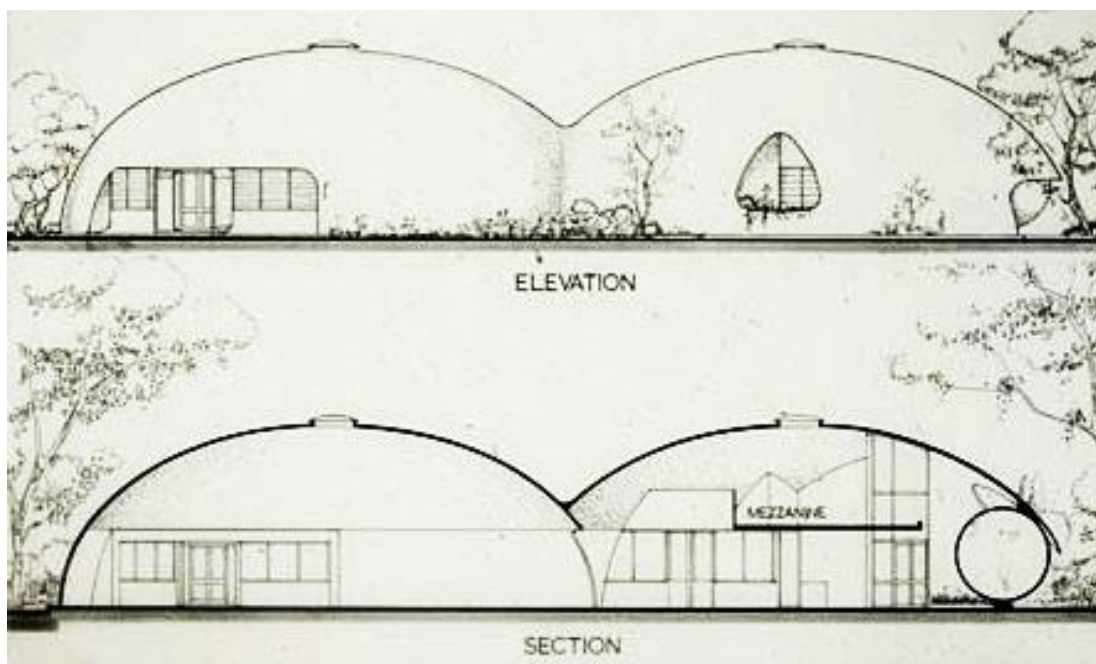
Narrabeen North Primary School Library, Elevation and section 1974 (Binishell B) (Source: Binisystems.com).
